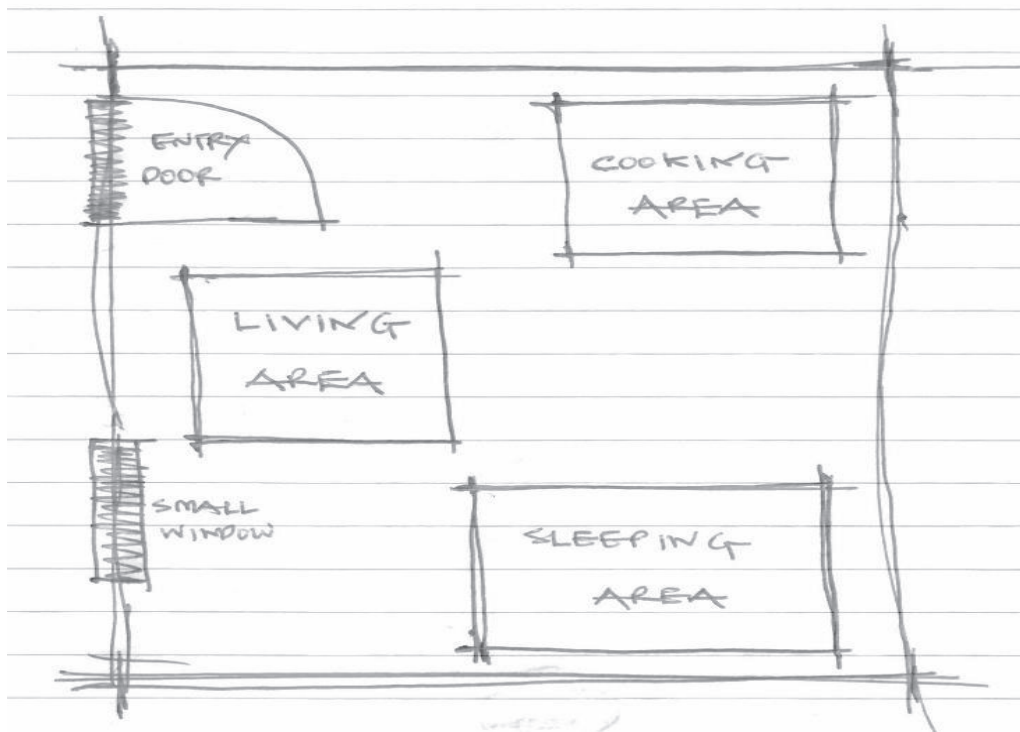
Field sketch showing the layout of spaces in BT.01's single-roomed house (Source: Author's construct)
